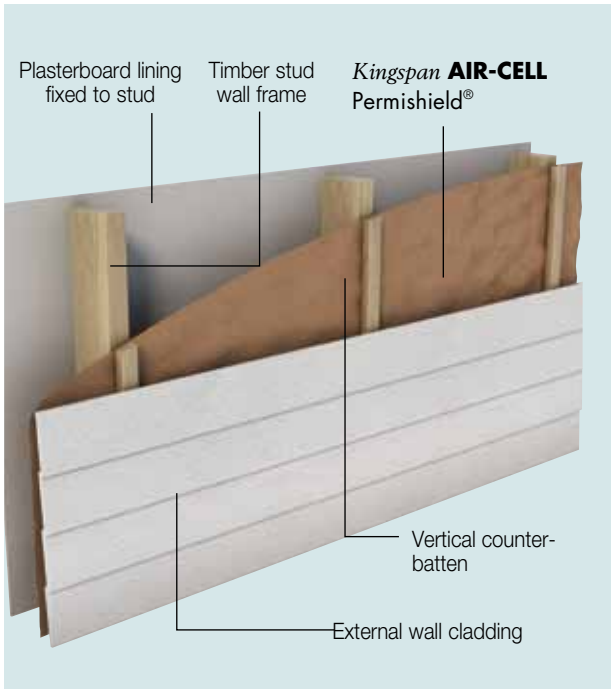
Kingspan AIR-CELL Permishield® in a timber-framed wall installation using counter-battens
